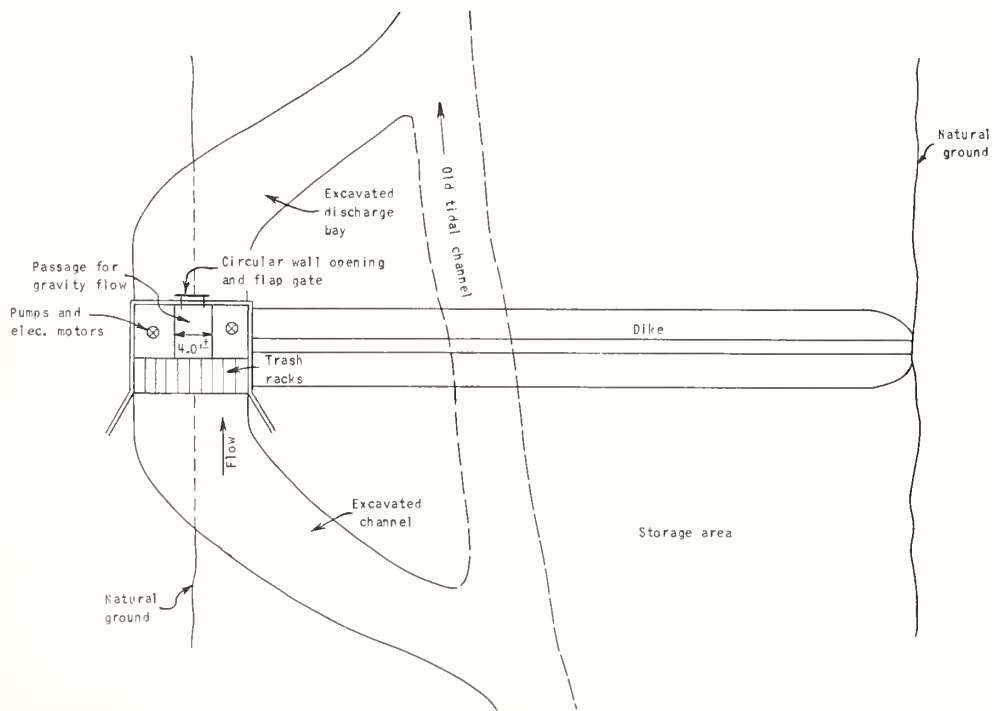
Plan View Showing Typical Installation of Dike - R/C Pump Structure - Tide Gate and Channels
